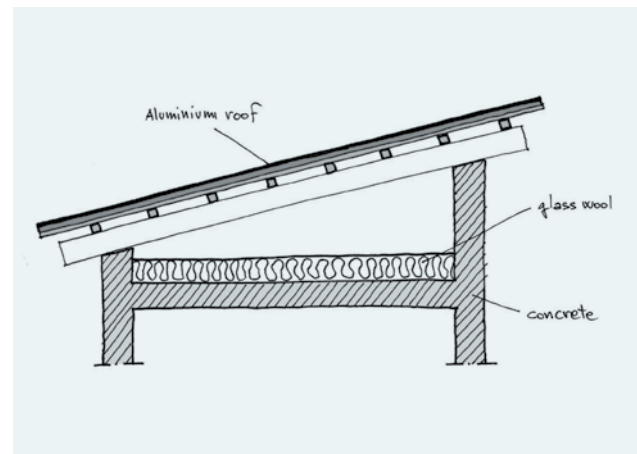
ALUMINIUM ROOF; CONCRETE CEILING AND INSULATION
